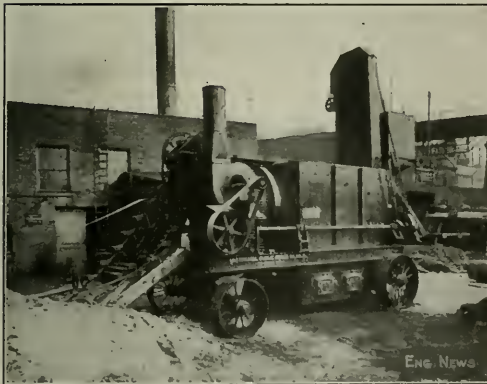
MIXER UNIT, CUMMER PORTABLE ASPHALT MIXING PLANT
